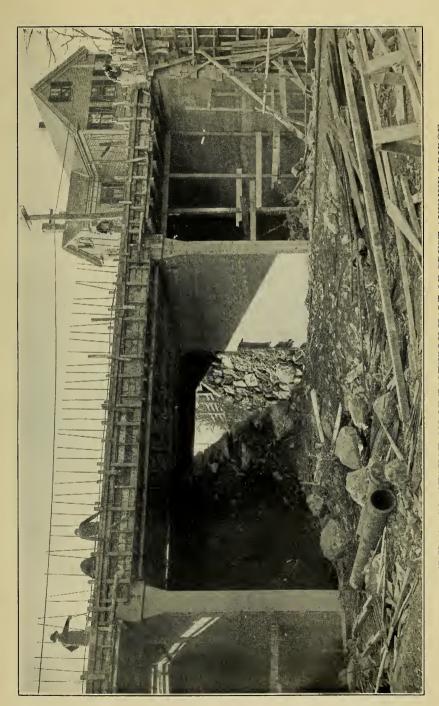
PLATE XIII.—CONSTRUCTION OF EASTERLY HALF OF CREST AVENUE BRIDGE.
